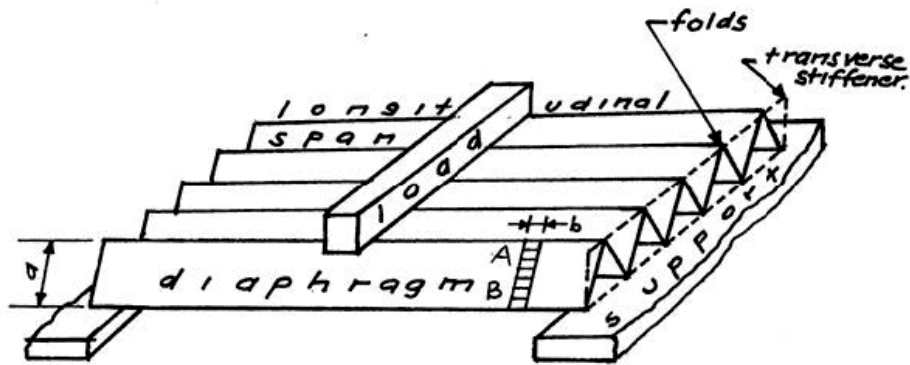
Single-fold plate roof as V-section beams [MLP07].
